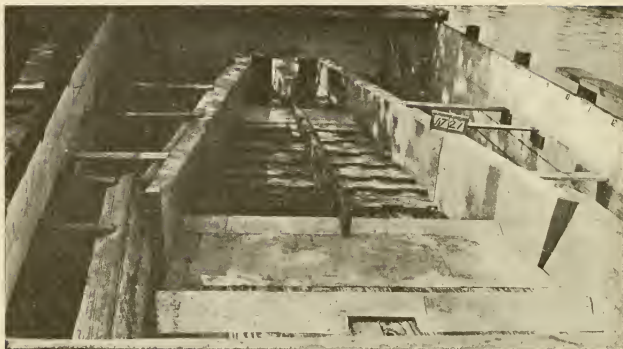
TYPE OF OUTLET FROM CONDUITS.
